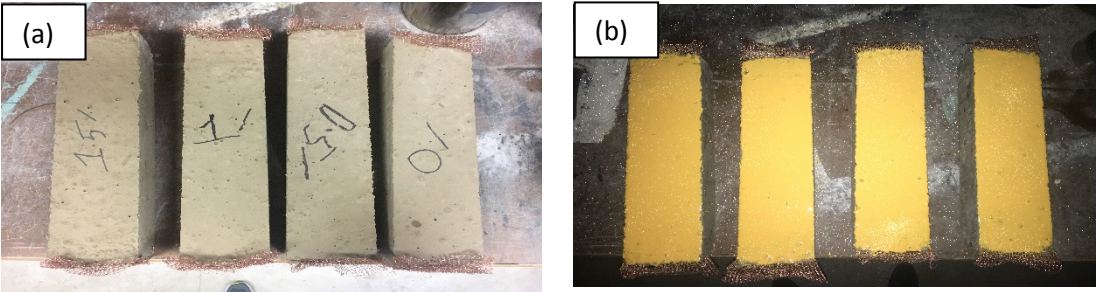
Beam specimen (a) and Epoxy based Painted beam specimen to mimic the road pavement (b)
